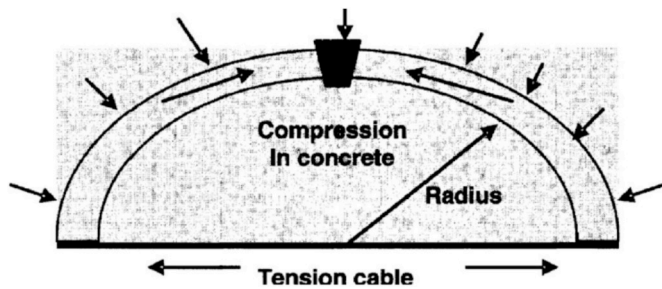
Wall segment cross section of the proposed arch-shaped structure, Meyers & Toutanji [138].
